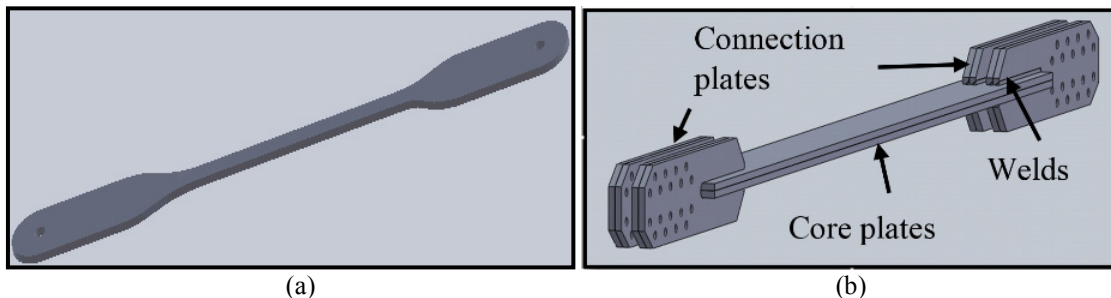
Steel core and connection plates: (a) conventional BRBs; (b) new generation BRBs
